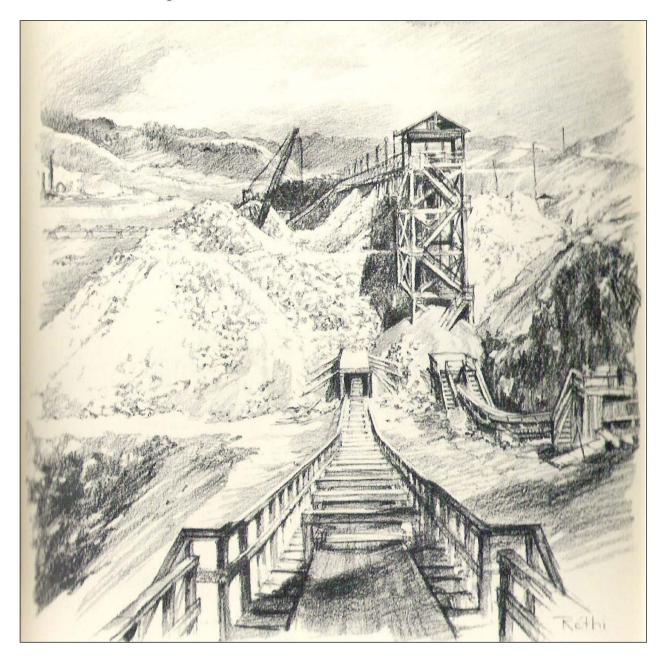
is a sketch of the side hill entrance to the tank excavations and lower access tunnel.
